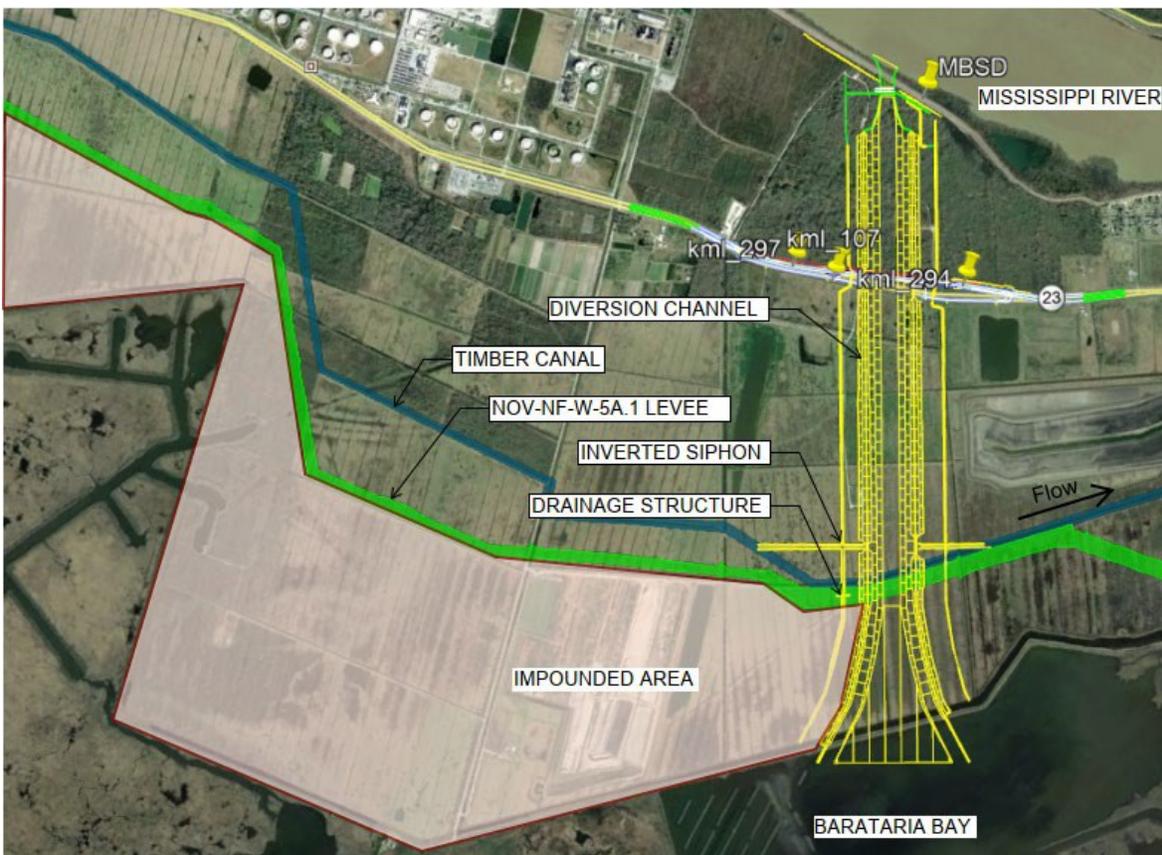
Proposed Project Drainage Structure and Location of Impounded Area (Polder).
